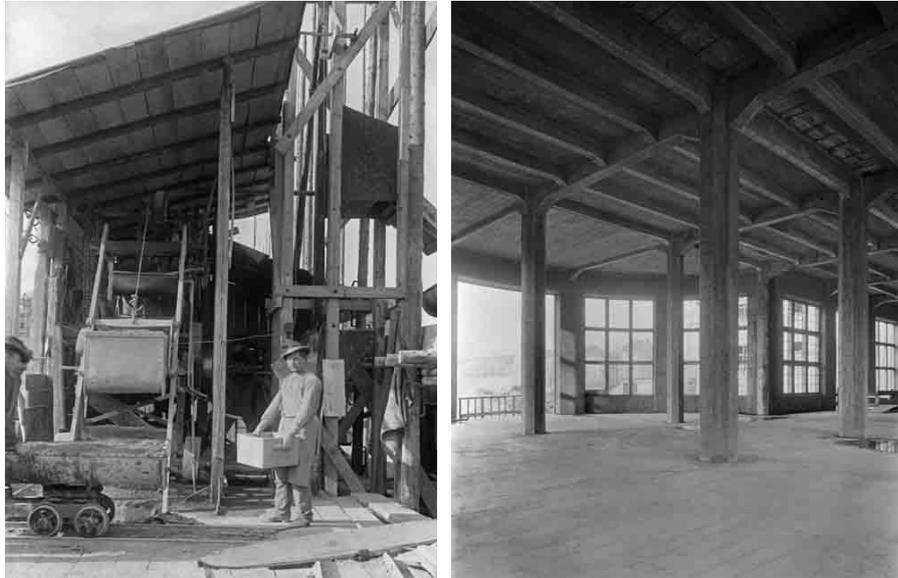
(left): Mixer and hoist; (ABDM-BN_57858)
